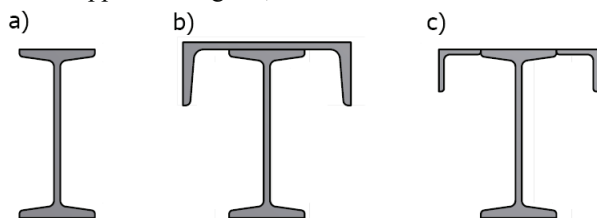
Examples of cross-section of the main girder and the reinforcement of the upper belt
